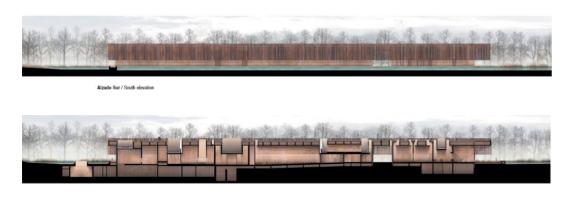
Sections and elevations, Hofheide crematorium, RCR architects (2015) • Source: El Croquis
